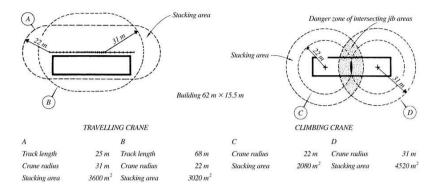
Radii of tower cranes and their effects on building shapes.
